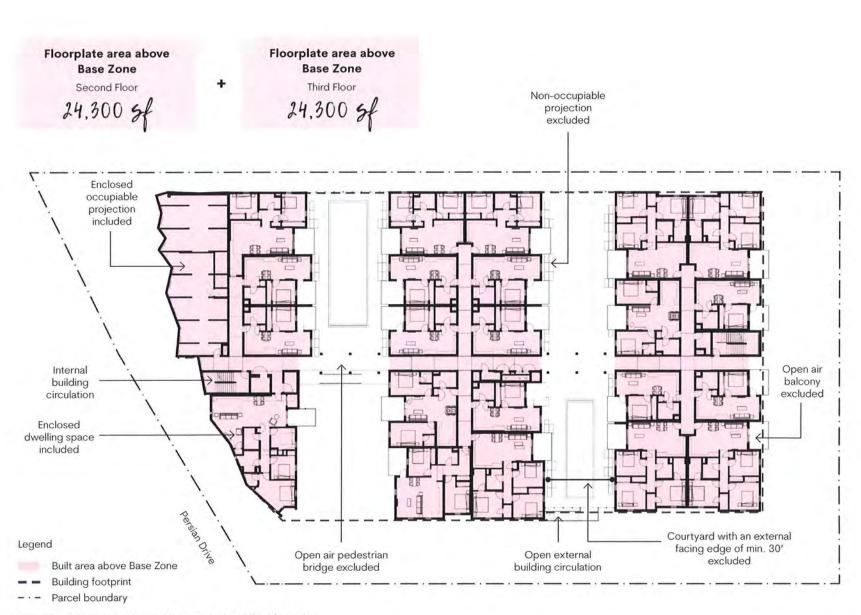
Edwina Benner Plaza second and third floor plan
